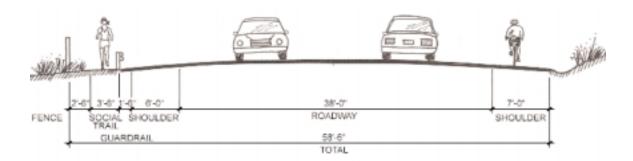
Existing Conditions at Lincoln Boulevard at Kobbe Avenue
